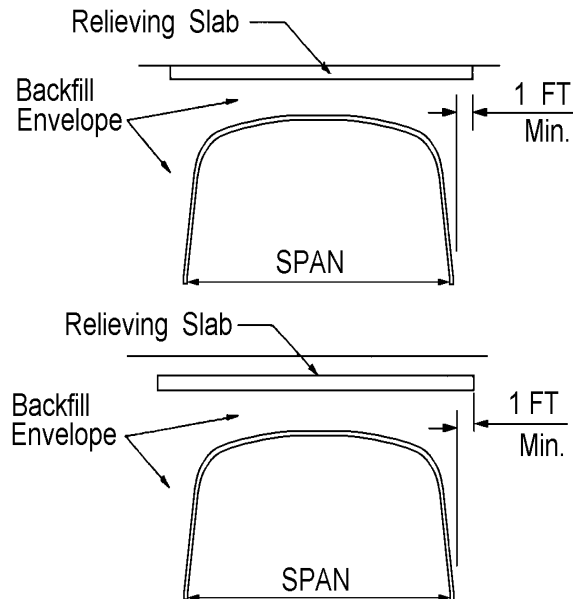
Metal Box Culverts with Concrete Relieving Slab
